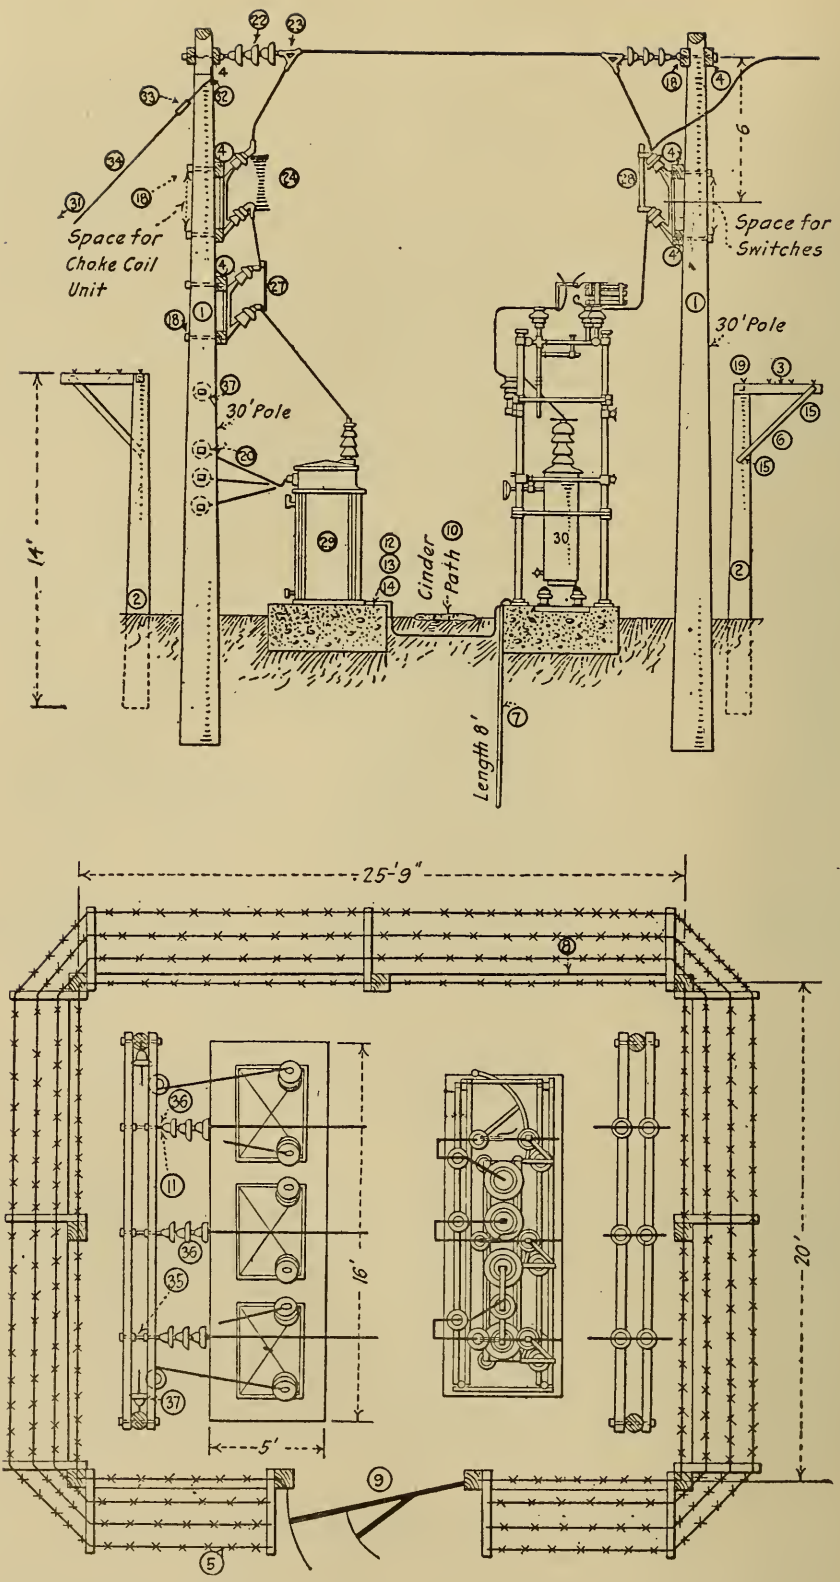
ELEVATION AND PLAN OF FOUR-POLE SUBSTATION
